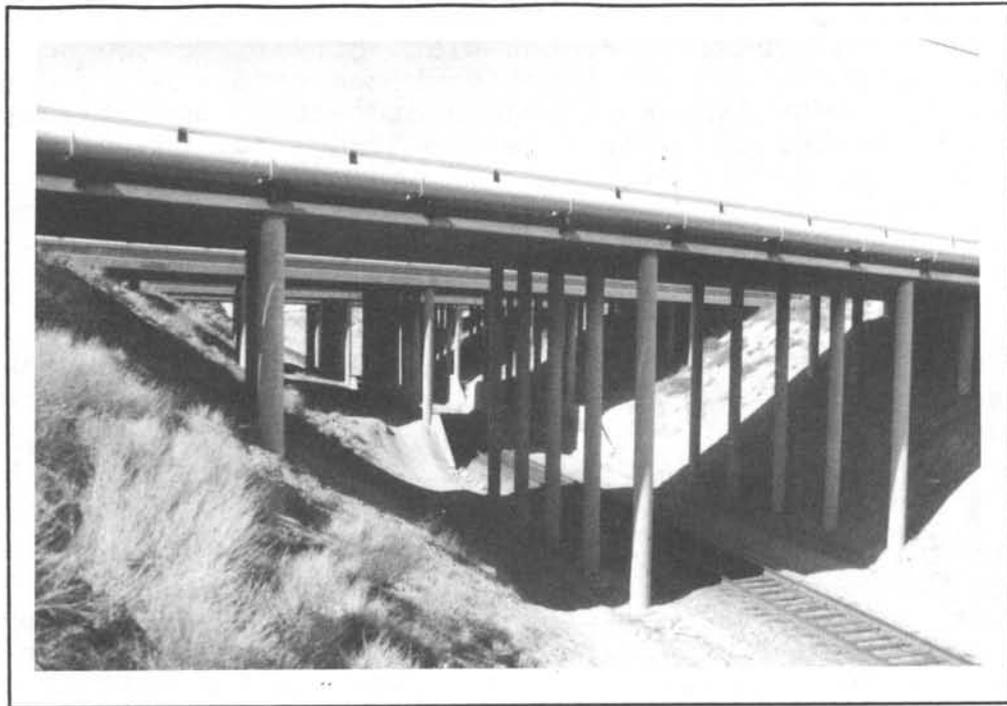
I-15 and Access Road Bridges Over the Railroad
